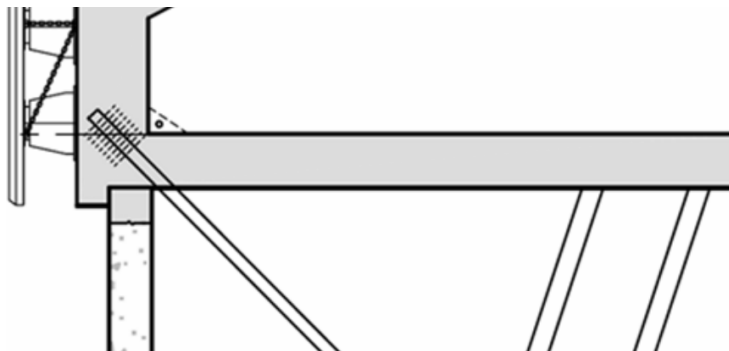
Detail connection MV-pile with relieving floor (BAM/Delta Marine Consultants, 2010)
